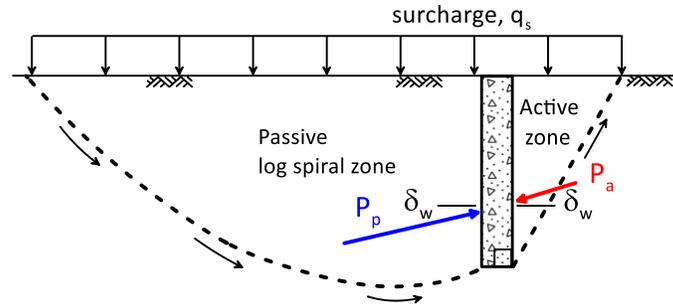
Failure surfaces for passive and active sides of anchor block
